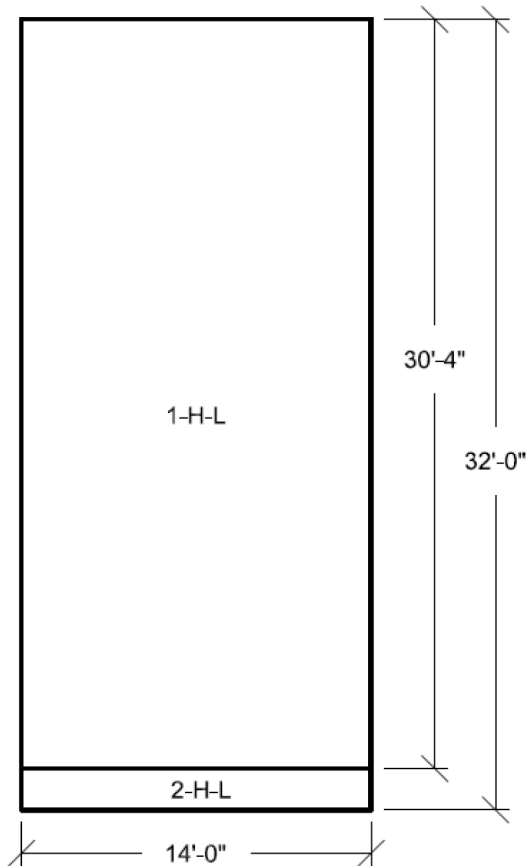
H.6-157 DGFSV Roof 5 Looking Down
